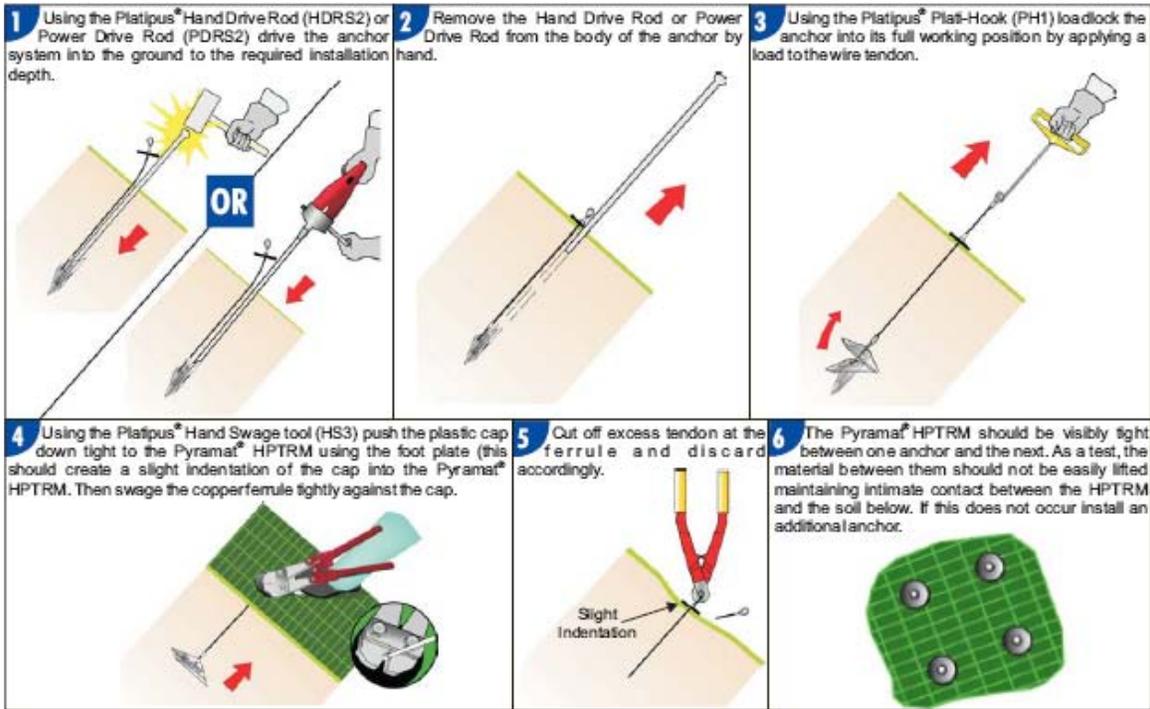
Installation of earth anchor (Platipus, 2007).
